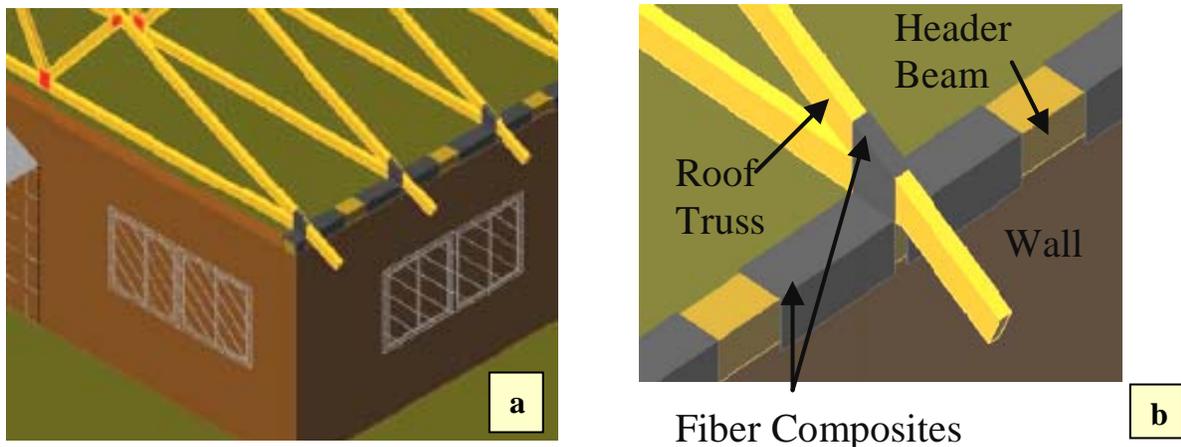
(a) Typical Residential Roof-to-wall Support Details, (b) Schematic for High Performance Advanced Fiber Composite Roof-to-Wall Connection
